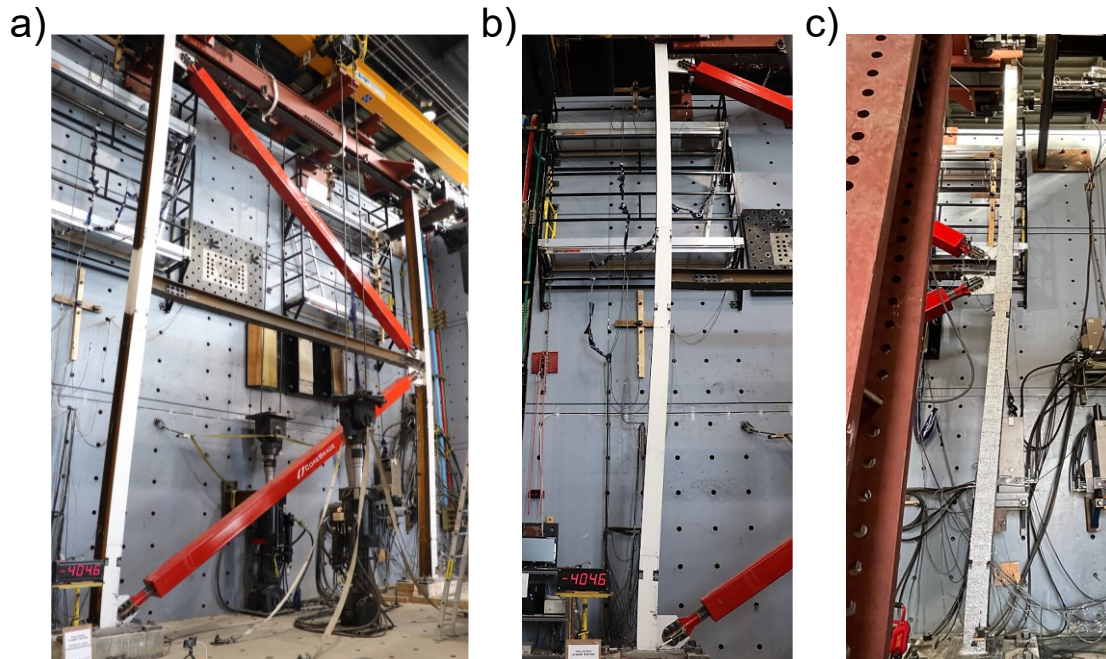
Deformed shape of the specimen at the end of the test: a) frame; b) east column; c) west column.
